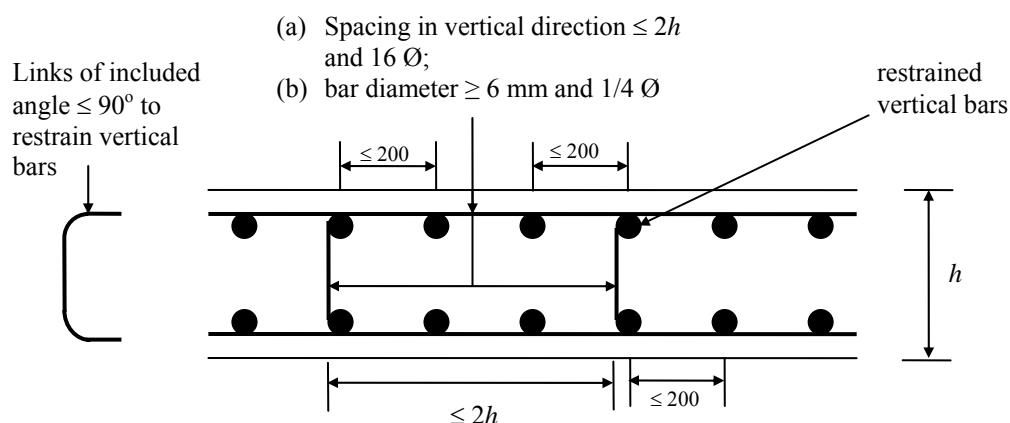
Anchorage by links on Longitudinal Reinforcements of more than 2% in Walls in Locations other than Confined Boundary Elements
